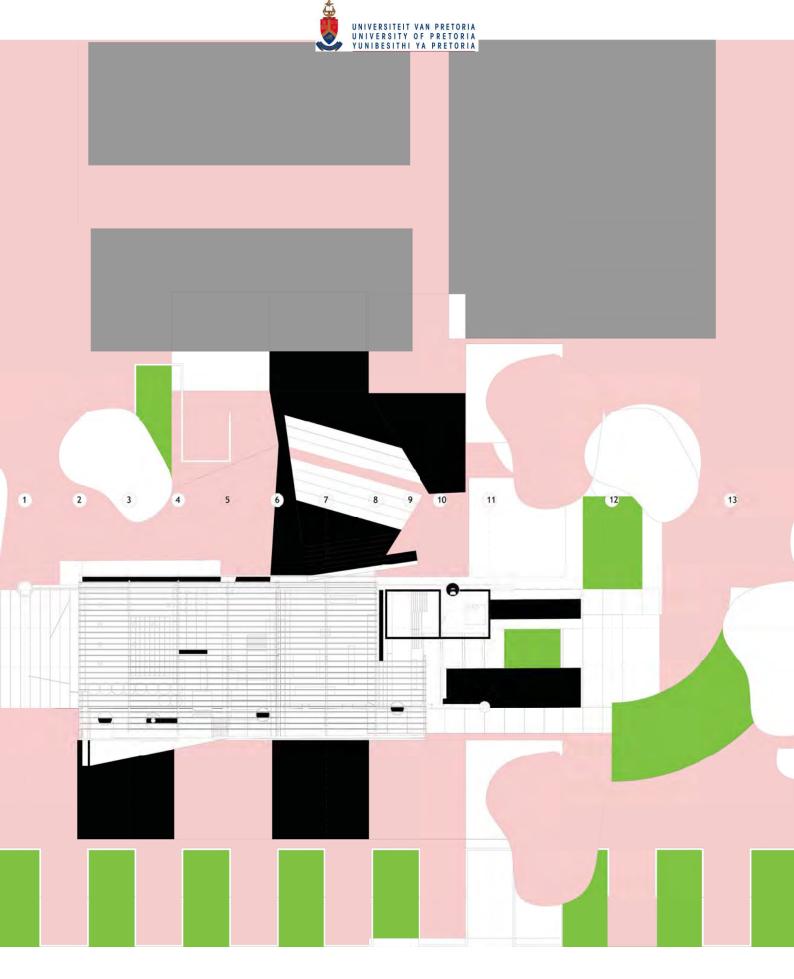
Plans of site and plans of the top floor of hte building, in progress.
